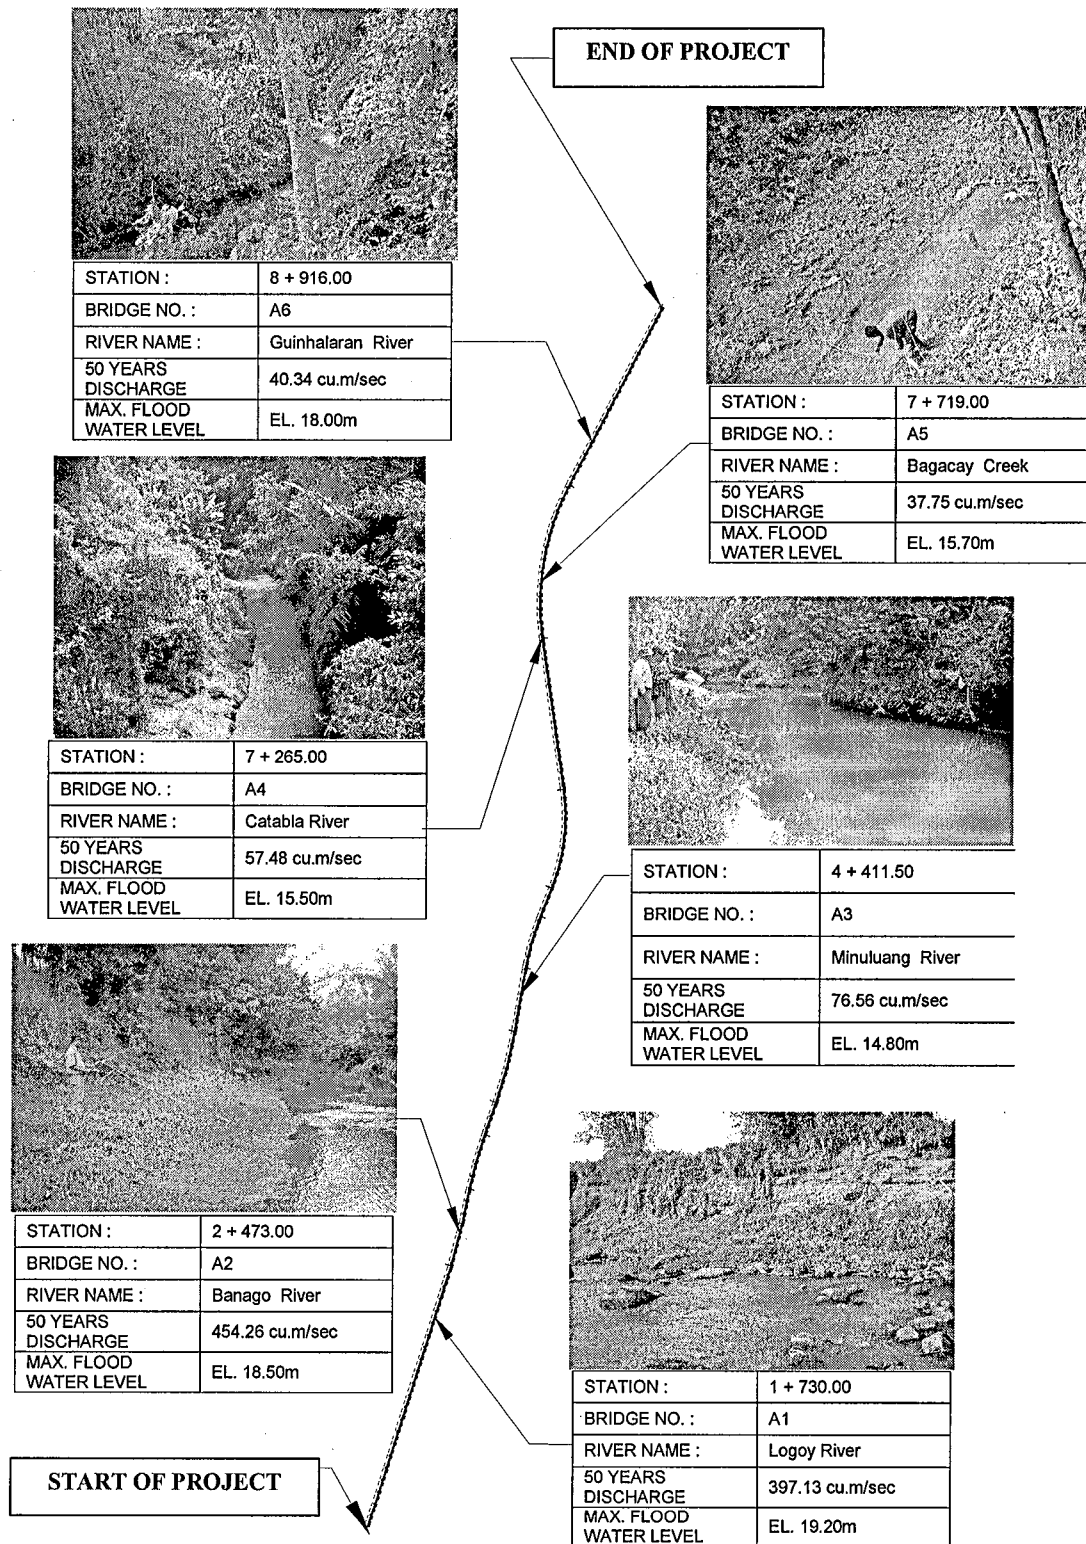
RIVER CONDITION AT PROPOSED BRIDGE SITES
